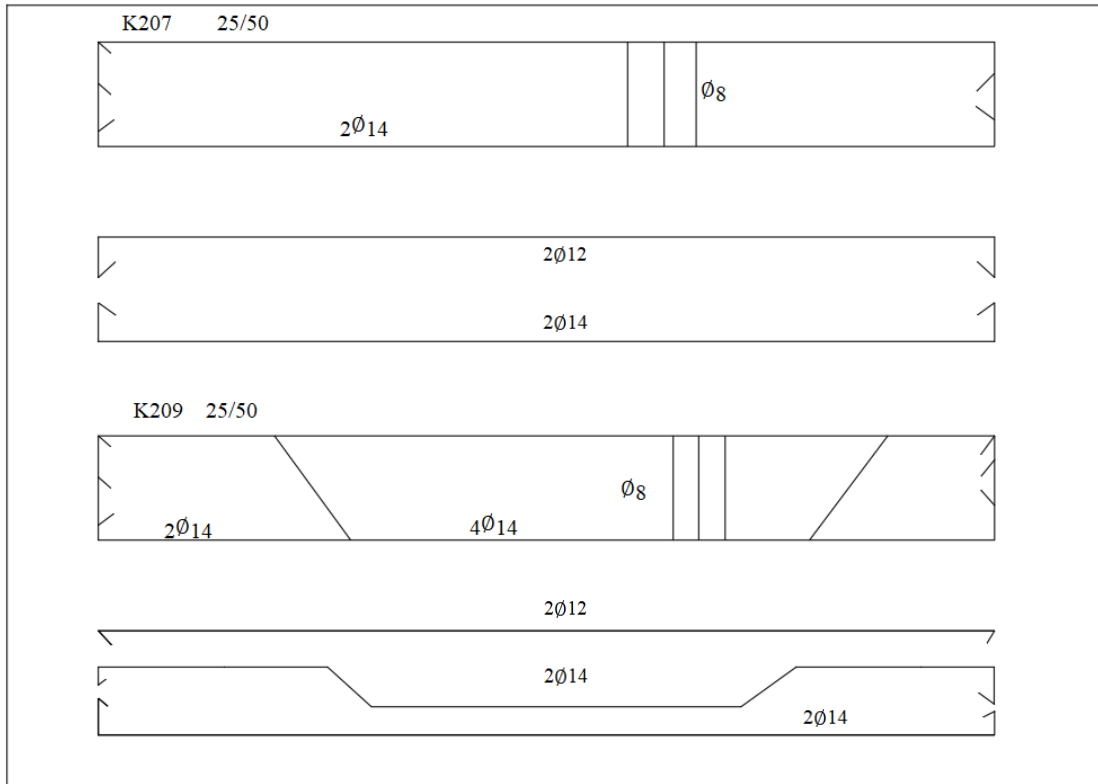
Reinforcement rebar of beams of studied building (K207 and K209)
